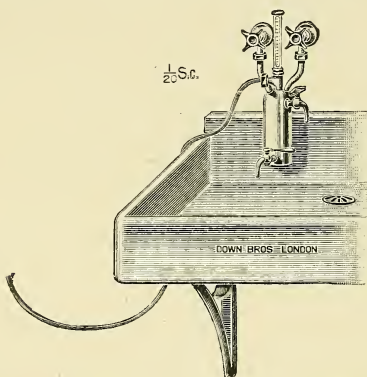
Sink with double Tap for hot and cold Water, fitted with Berkefeld Filter.
